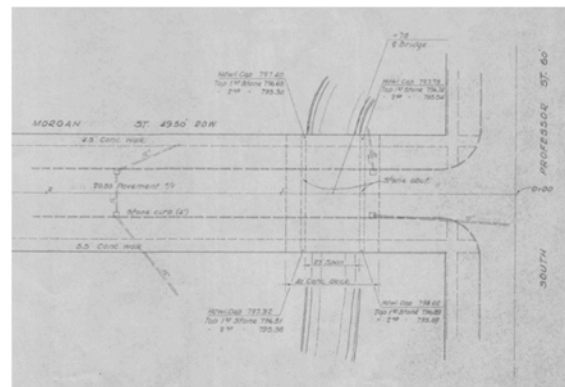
Morgan St. Bridge Site Plan (1978)
